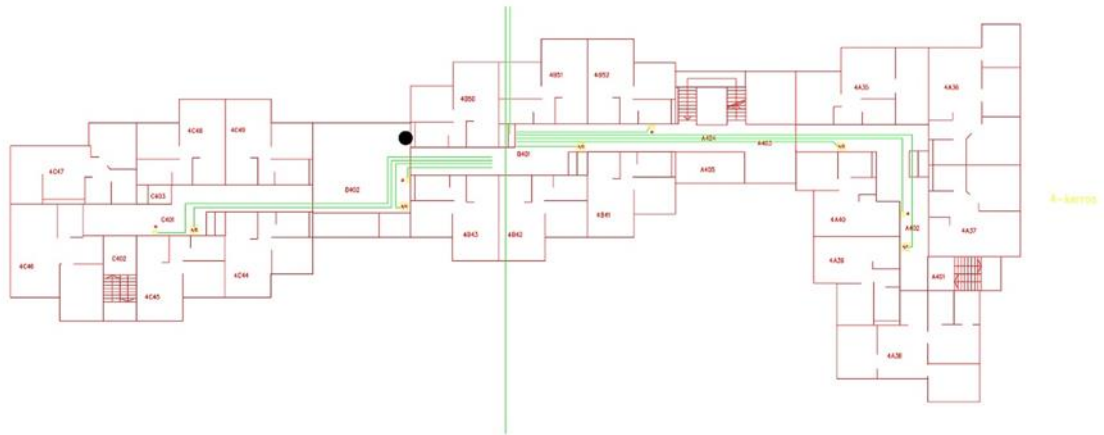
Floor plan of the 4th floor with cell position pointed to by the black dot.
